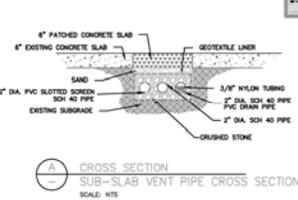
(Above Left). SSV Modification Trench Detail: After removing the carpet and cutting a trench through the slab, 2 lengths of slotted PVC were installed in a crushed stone backfill, covered with a geotextile and sand, and then the floor was re-cemented. Prior to re-carpeting, the joint between the floor and the footer was sealed.
